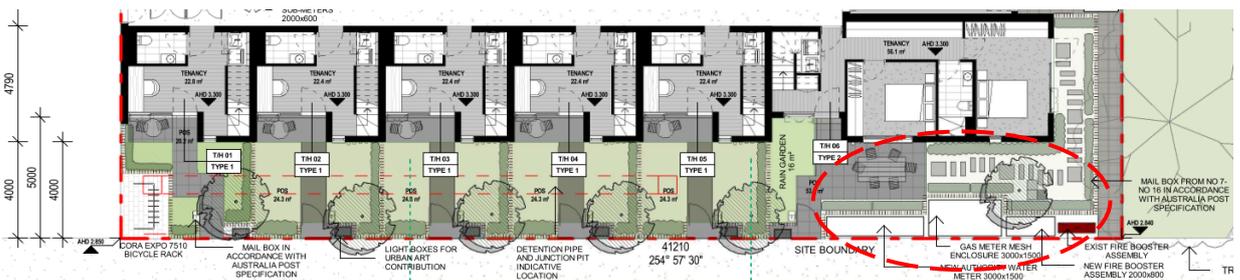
Section of Plan SK100 (Ground Floor Plan) – Original applications gas and water meter location.
